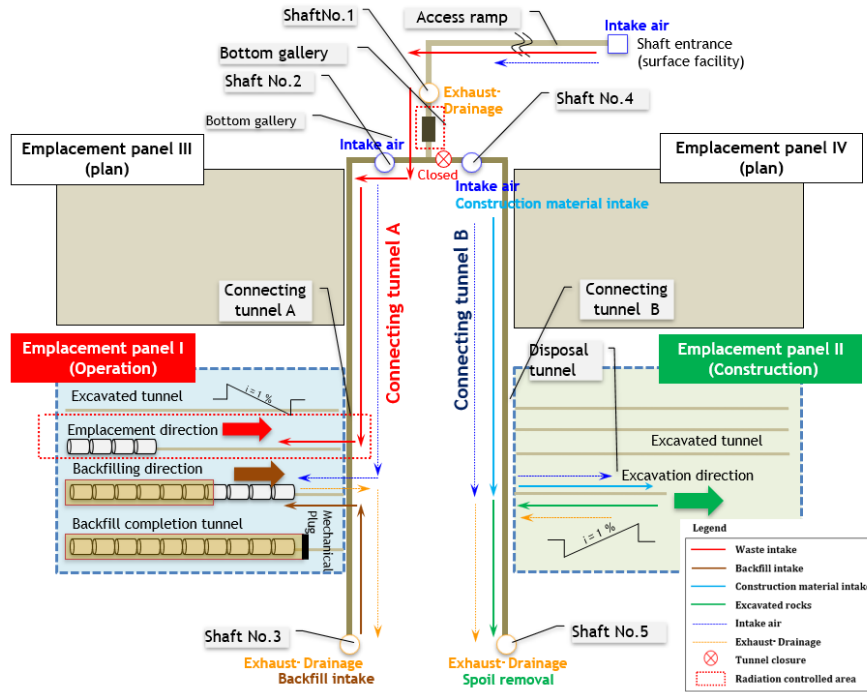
Conceptual sketch of tunnel layout (HLW DET panels)
